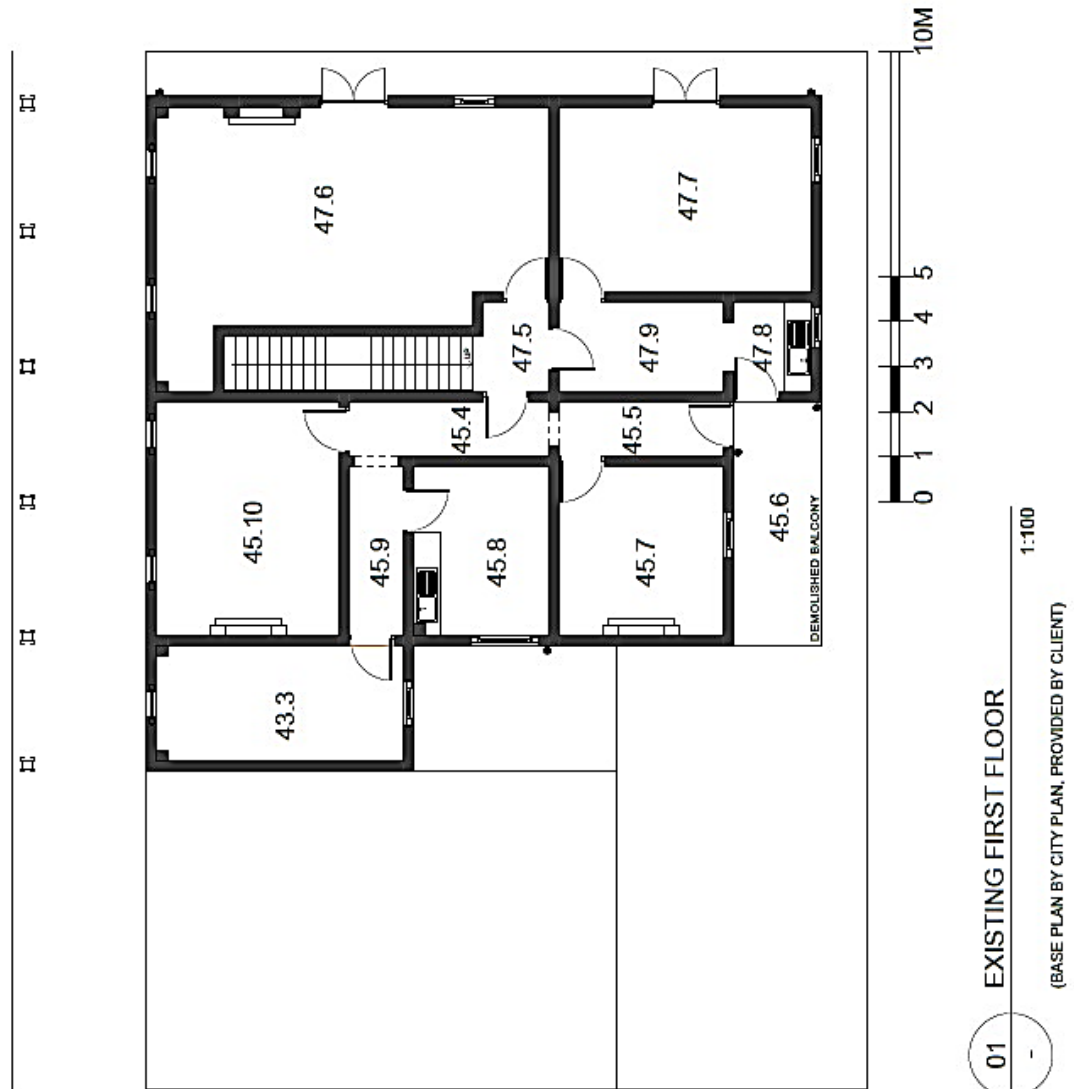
Existing first floor plan of George Street Shops. Source: City Plan via Sydney Metro, April 2022. Room numbering by OCP Architects.
